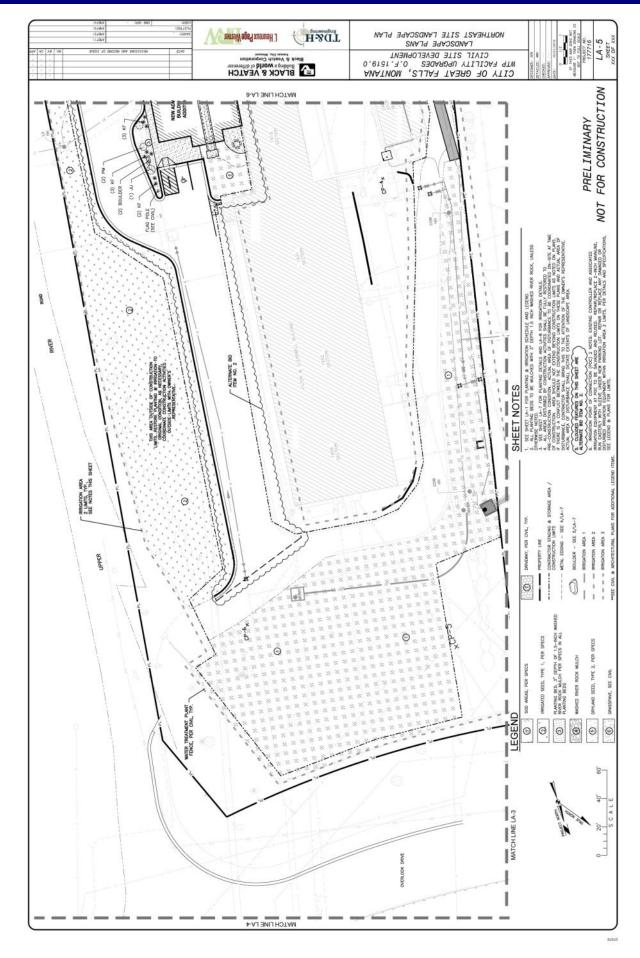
EXHIBIT G-LANDSCAPE PLAN (NORTH)
